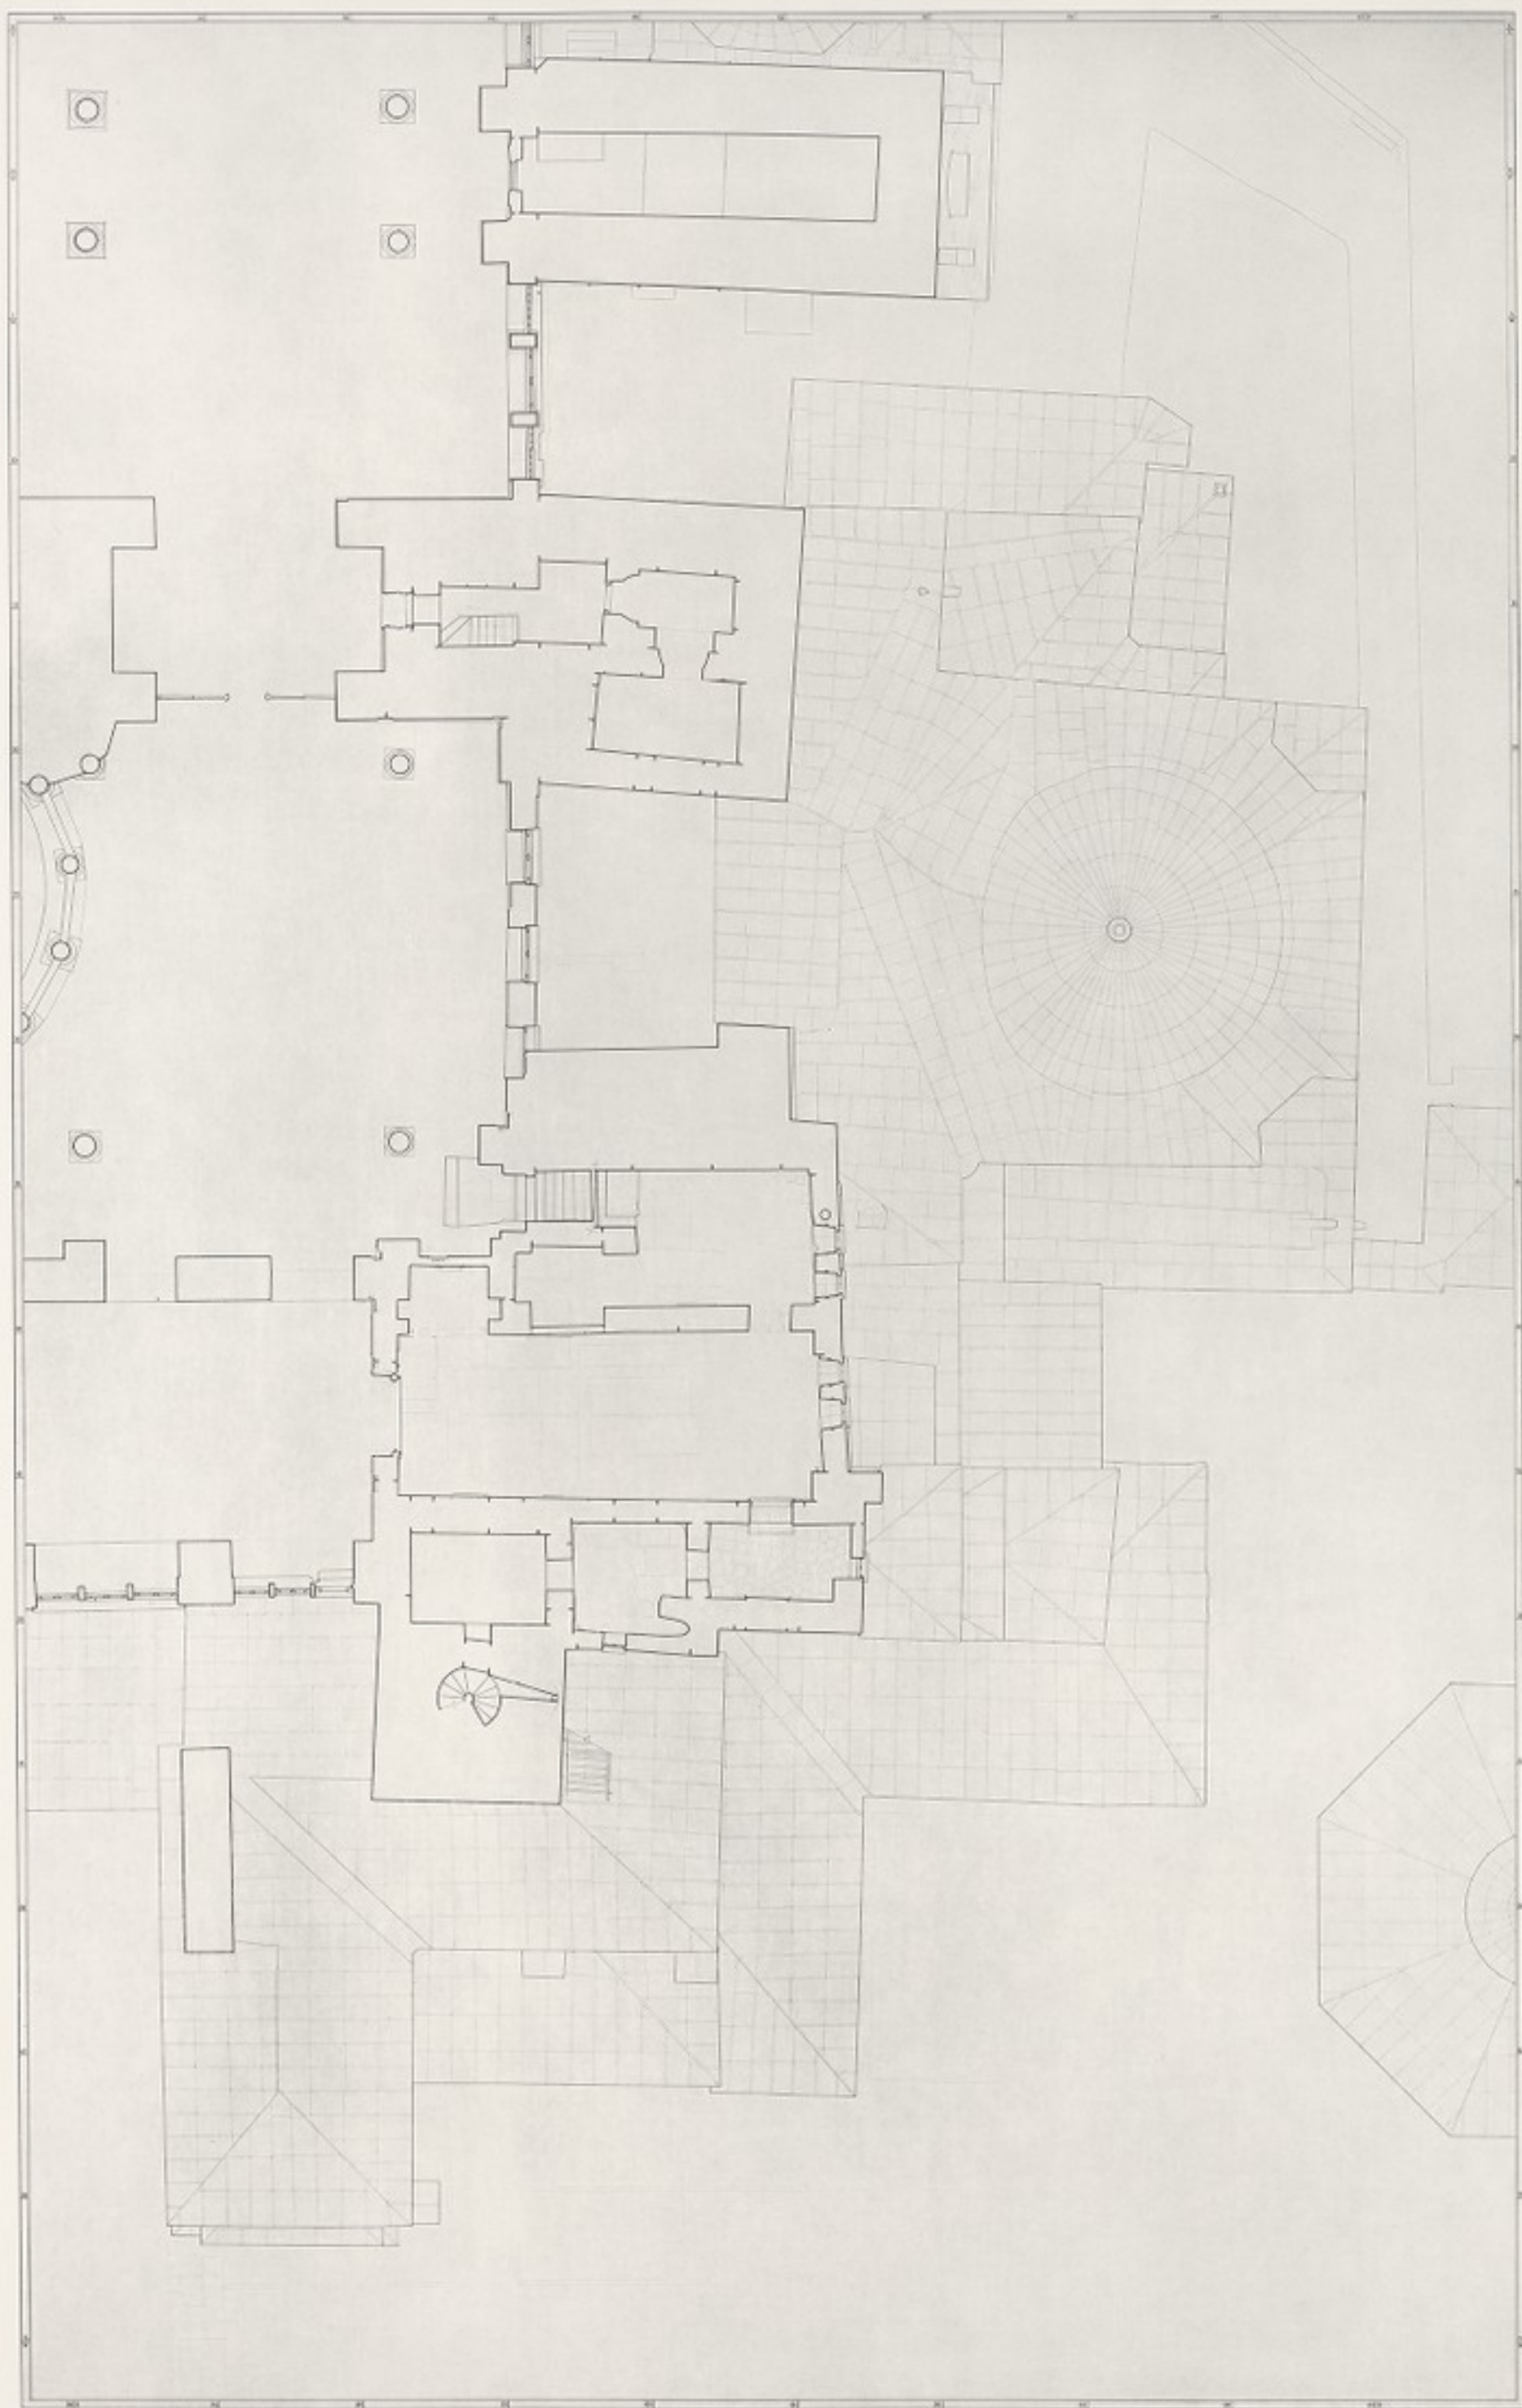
PLAN AT GALLERY LEVEL, SOUTHWESTERN EXTERIOR AREAS
